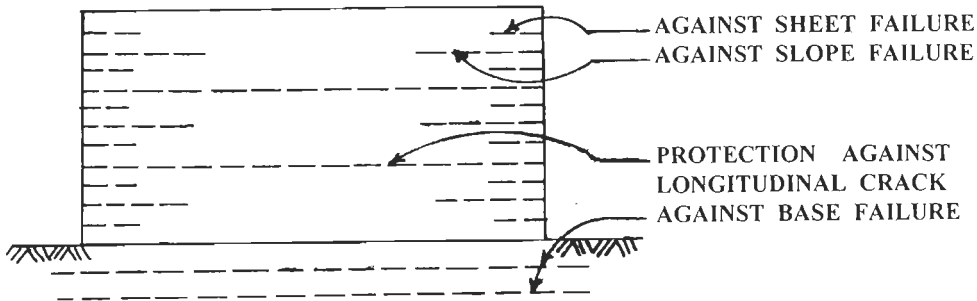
CROSS SECTION OF REINFORCED EARTHEN EMBANKMENT.
